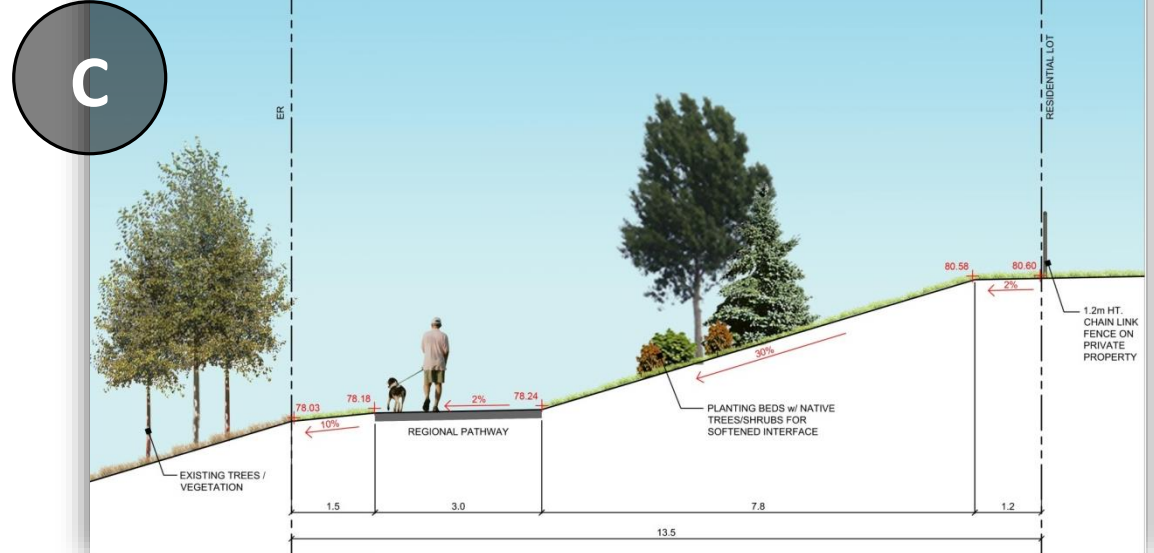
VIEW LOOKING TOWARD NORTH NEIGHBOURHOOD PARK
